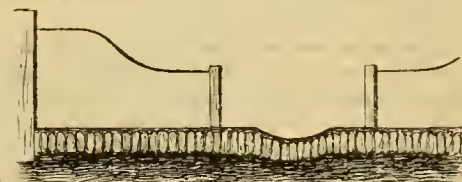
COBBLE-STONE PAVEMENT FOR COW-HOUSES.
